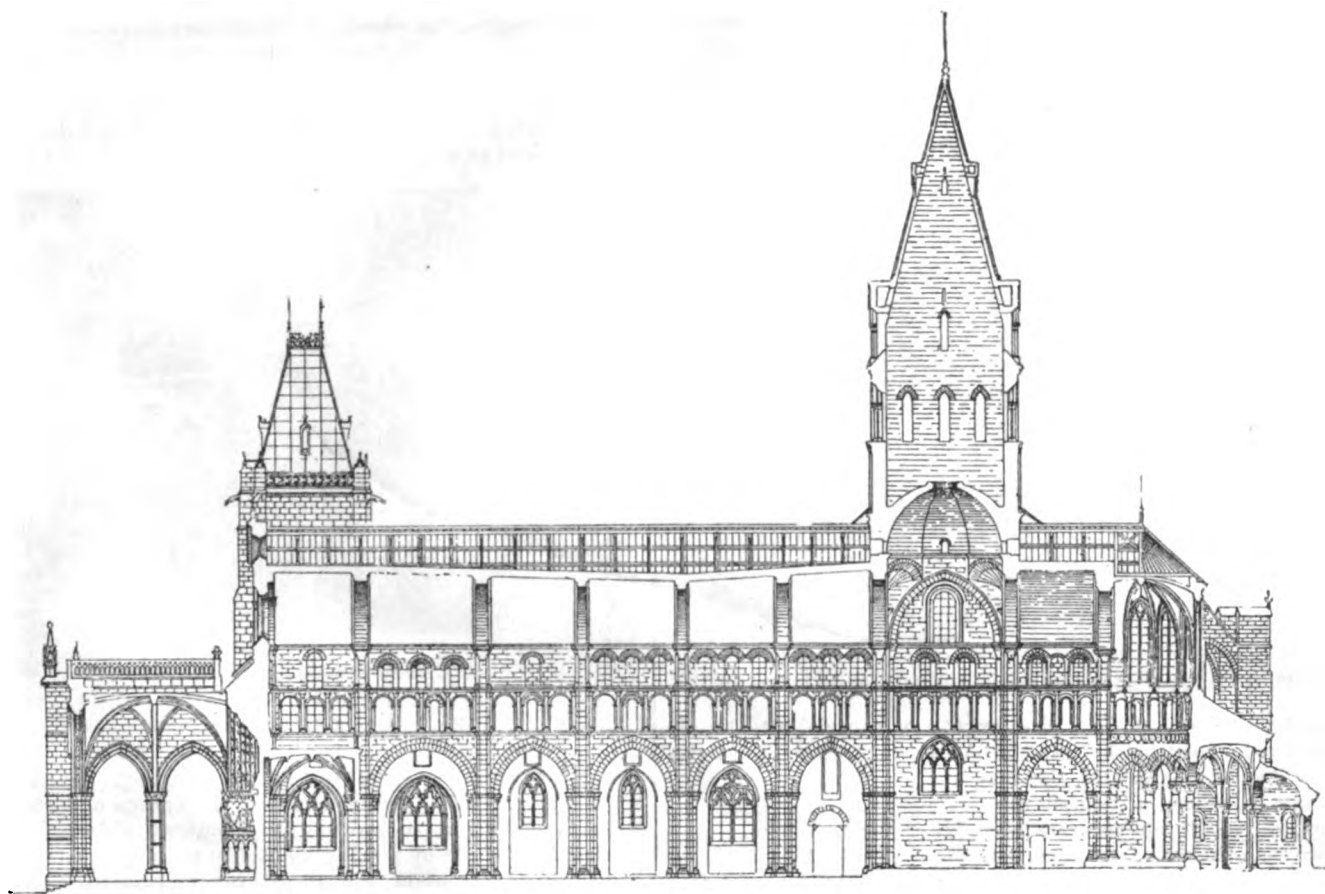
Longitudinal Section of Notre-Dame at Beaune.
